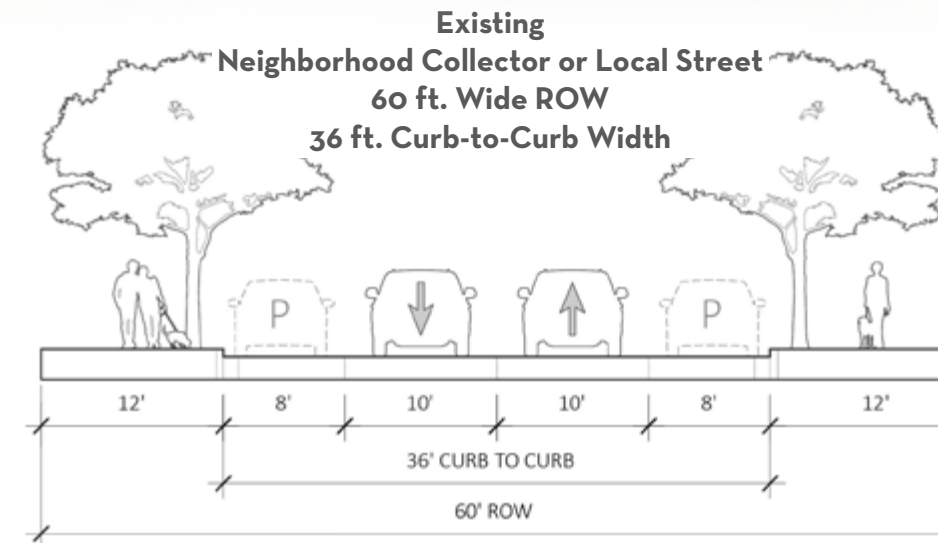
Existing: Typical Neighborhood Collector or Local Street with a 60 ft. wide ROW and 36 ft. wide curb-to-curb.
